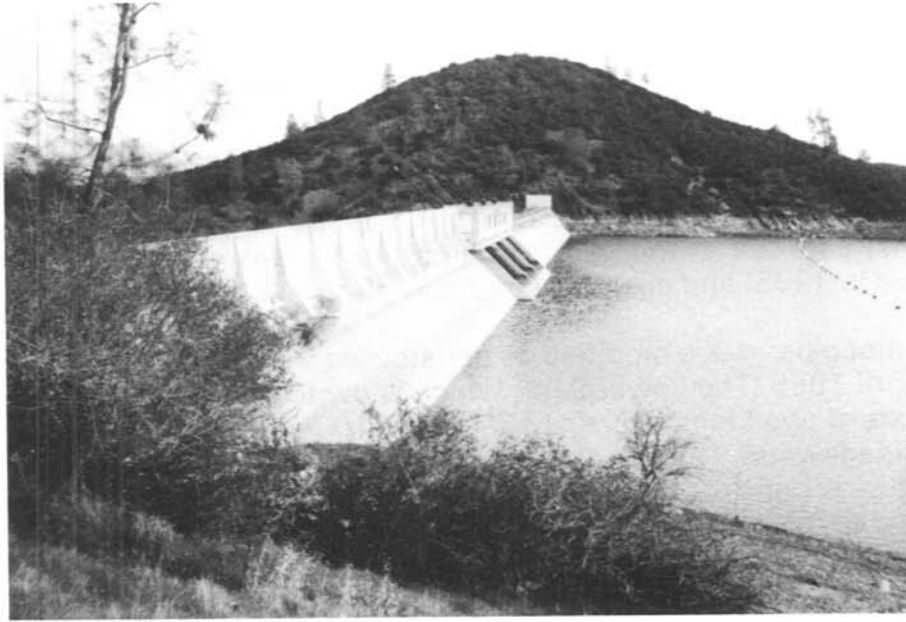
Upstream view of Stony Gorge Dam from the left abutment showing the counterfort wall to the left of the spillway gatehouse. Photo by Joan Goodwin. 10/26/89
